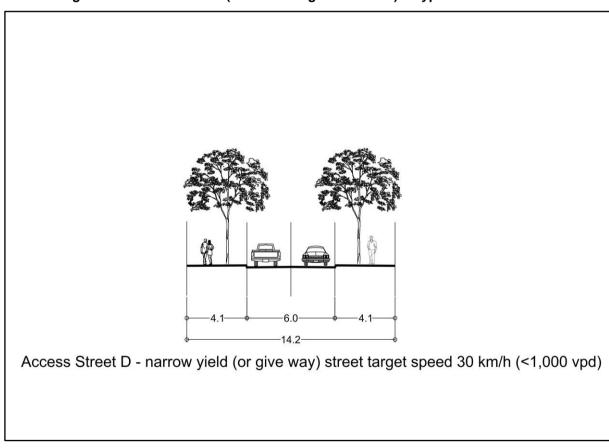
Access Street D (Liveable Neighbourhoods) – Typical Cross-Section
